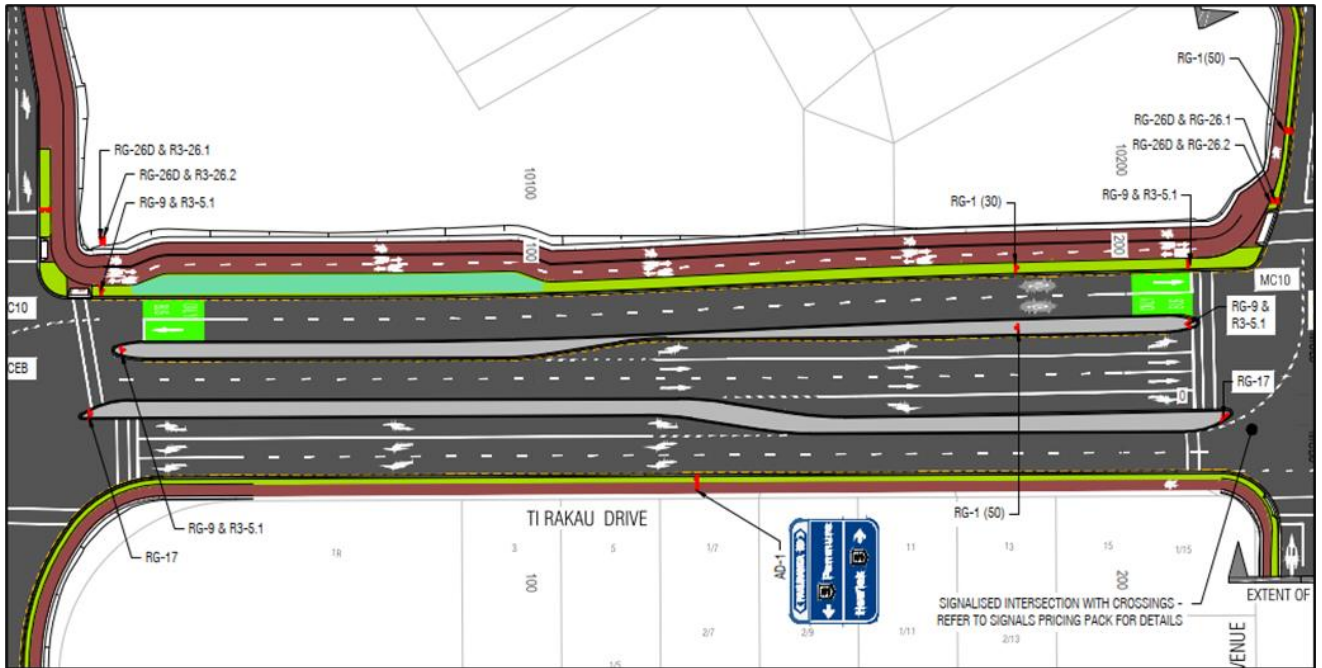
EB2 Proposed Layout - Pakuranga Road to Aylesbury Street
